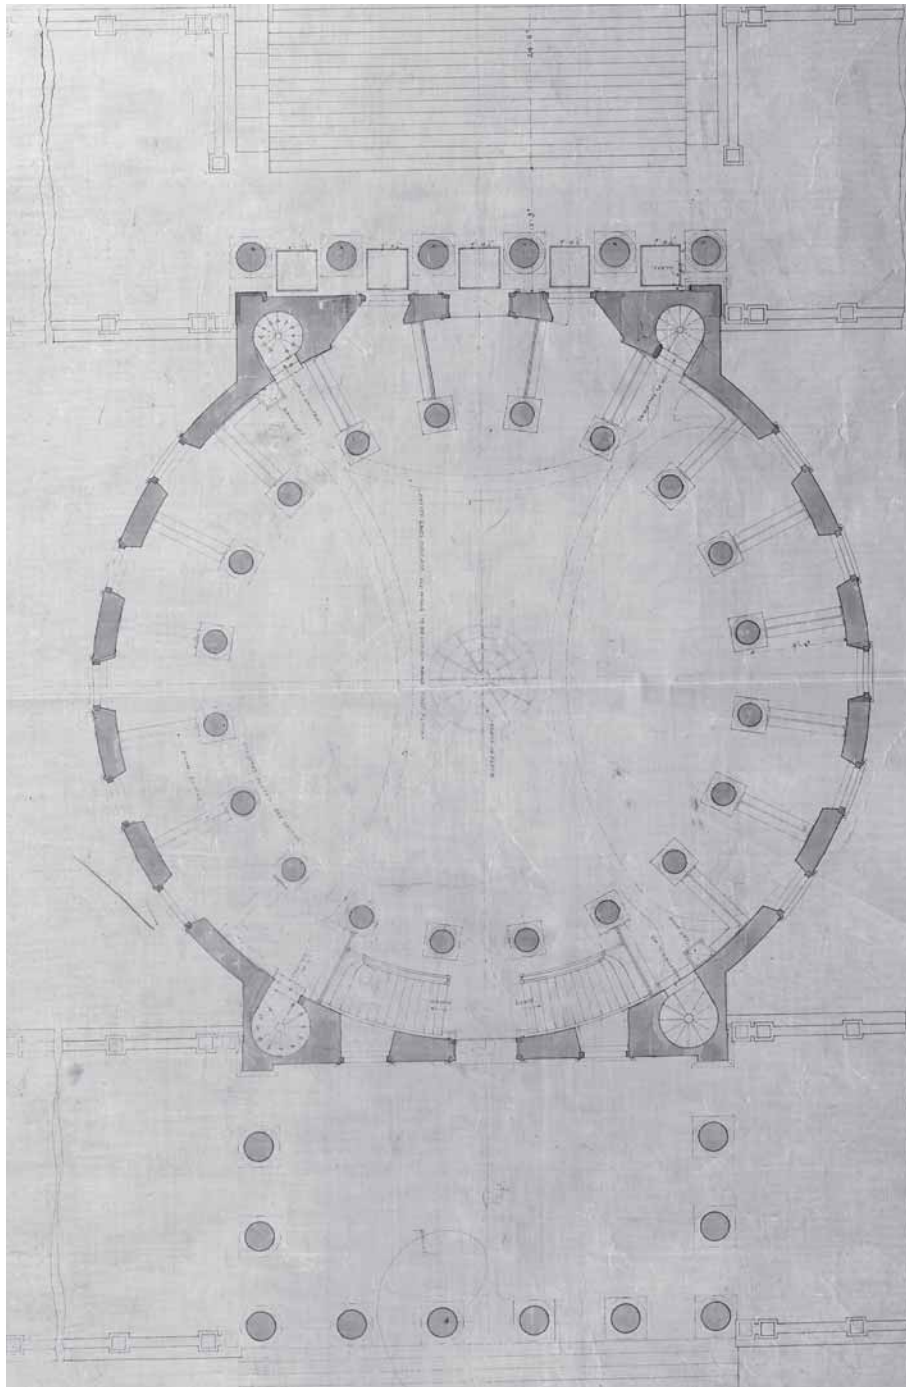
McKim Mead & White first floor plan of the Dome Room. [Special Collections, UVA]
